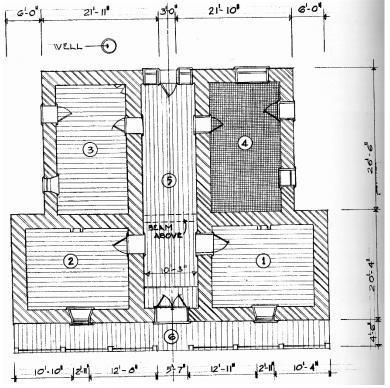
Typical floor plan of a Territorial Style house in Taos with central hall. (Image from Bunting 1976)
